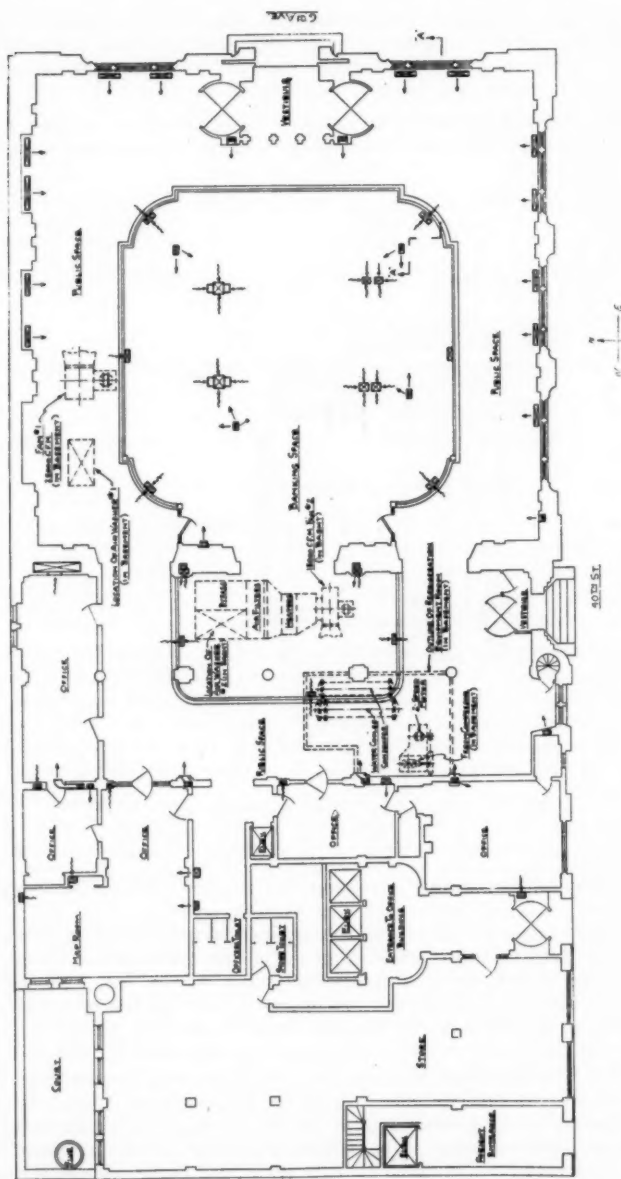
MAIN FLOOR PLAN WITH AIR CONDITIONING EQUIPMENT SHOWN IN OUTLINE
